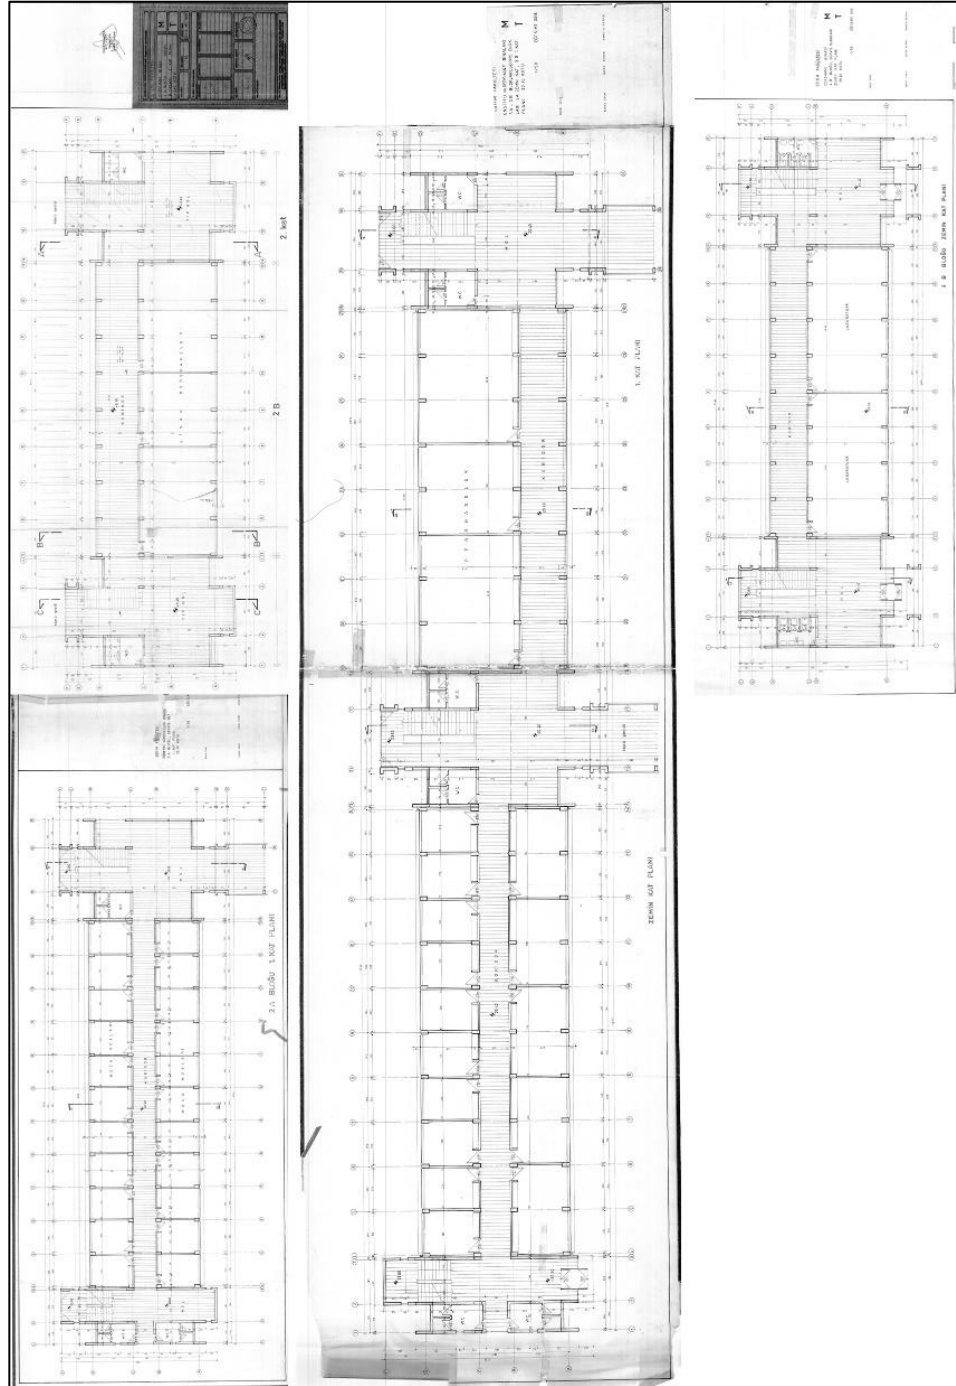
Original plans of the first floor of the Block 2A, the second floor plan of the Block 2B, the ground floor plan of the 3A Block, the first floor plan of the Block 3B and the ground floor plan of the Block 4B in the Faculty of Educational Sciences (archive of Ankara University Directorate of Construction and Technical Works)
